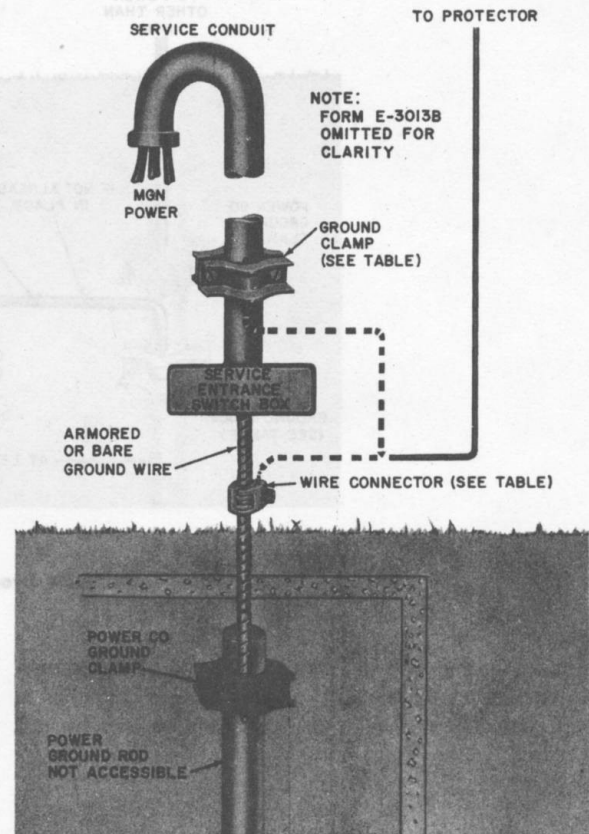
MGN Power Grounded to Inaccessible Ground Rod—No Water Pipe or Connection to Pipe Not Possible
